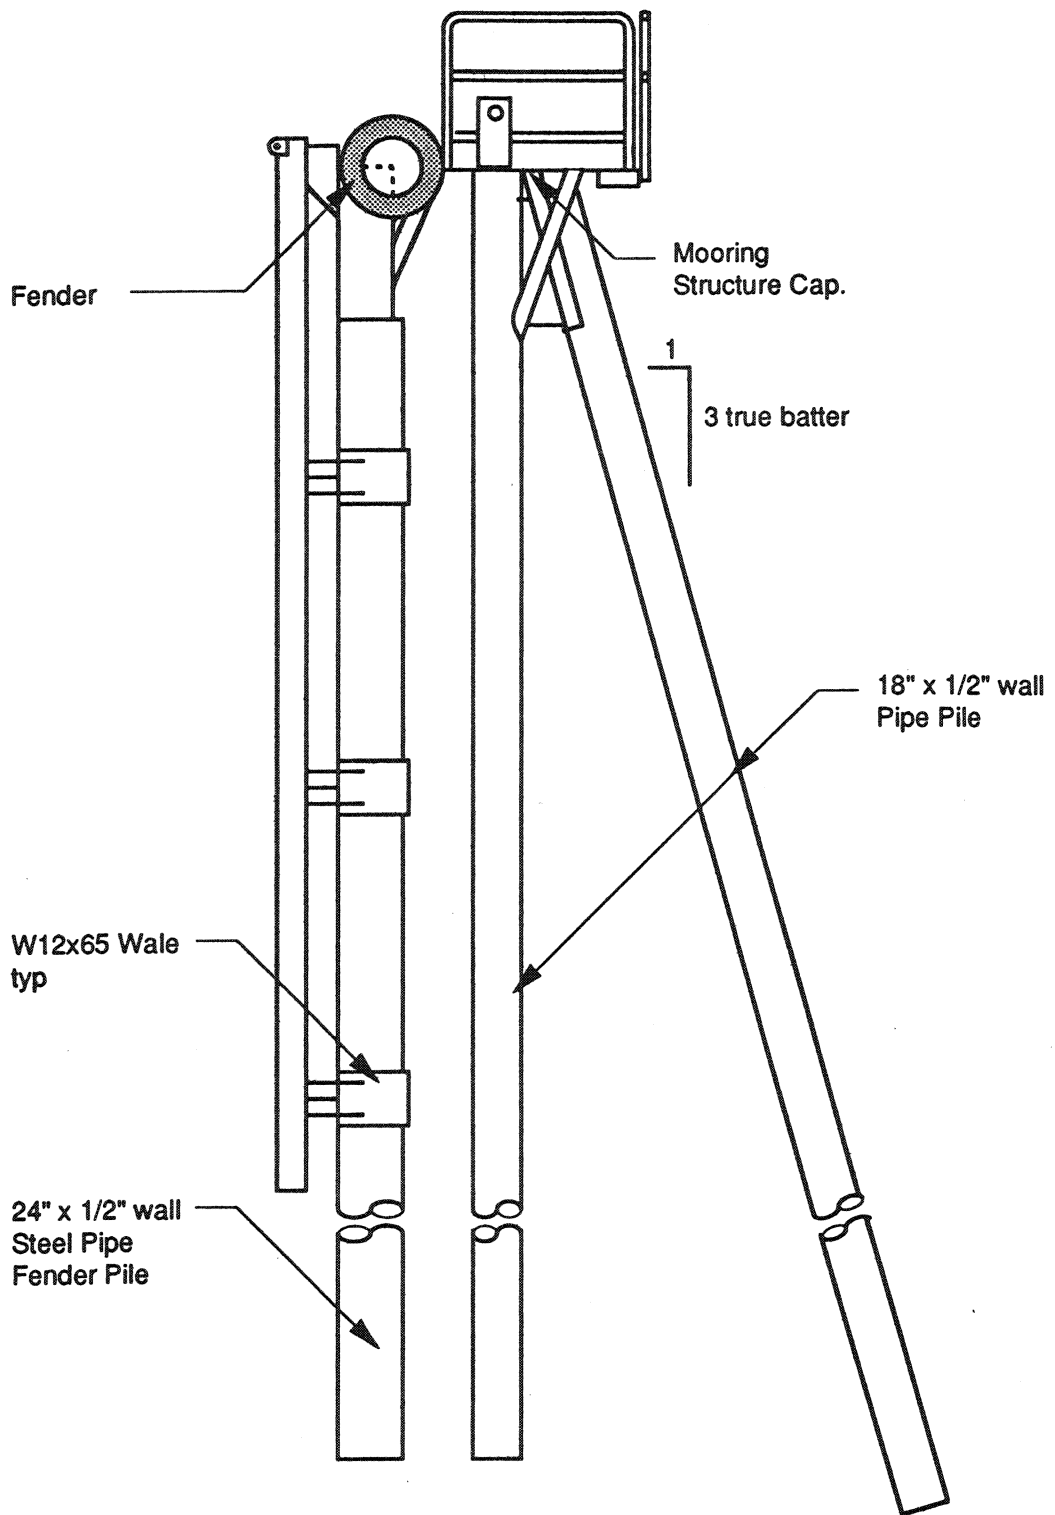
Side Elevation of Mooring Structure – Ketchikan, Alaska
